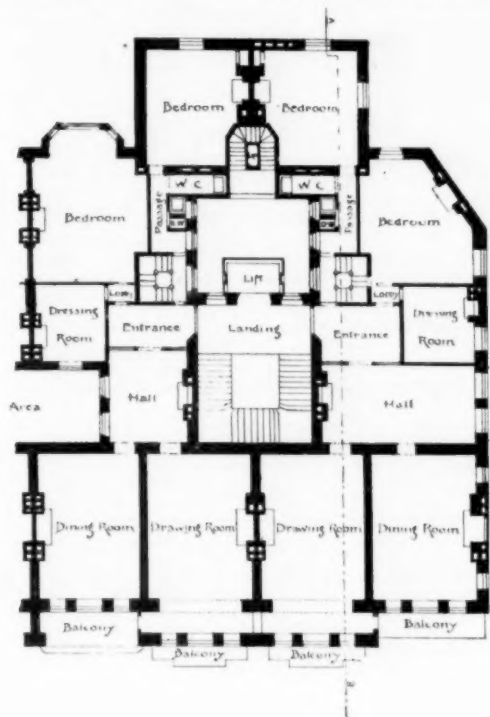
Plan of Upper Stories of an Apartment-house in London, R. Norman Shaw Architect. After the *Building News*.
